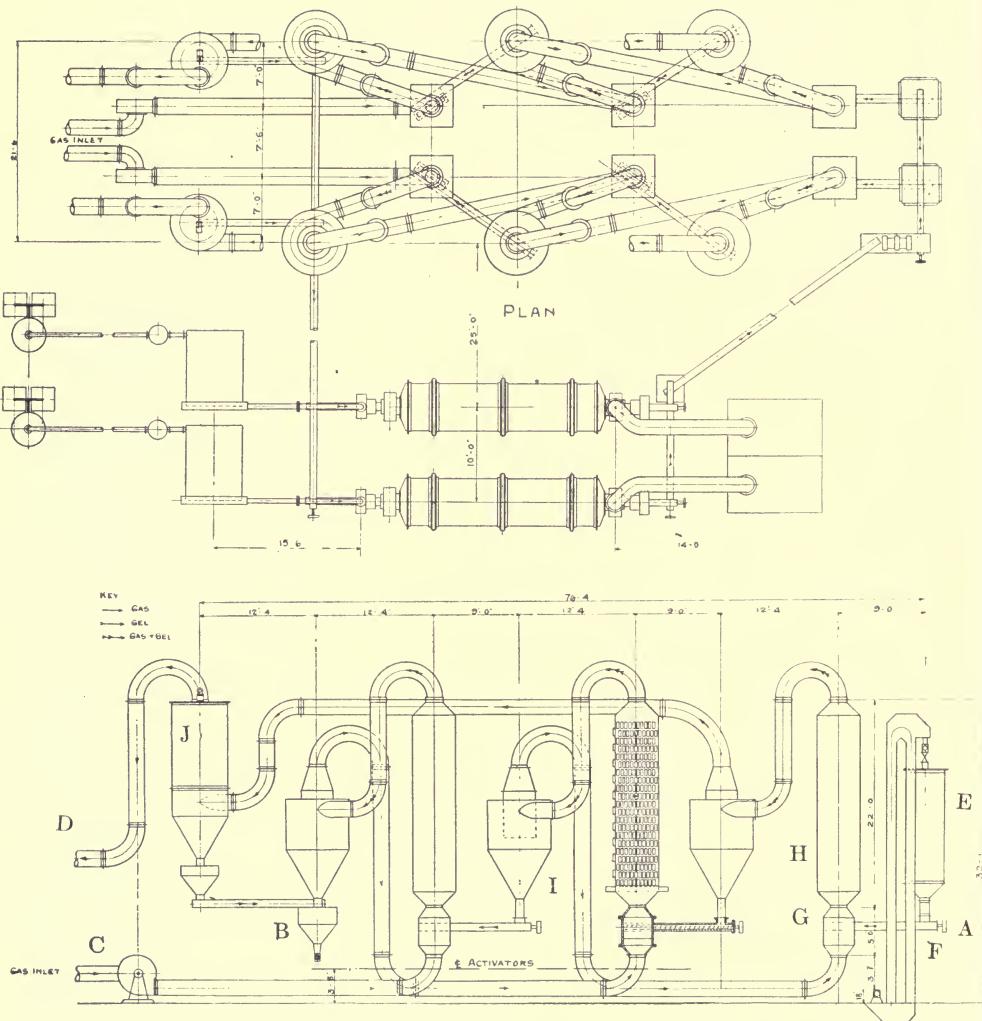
Silica Gel Adsorption Plant, Plan and Elevation.
